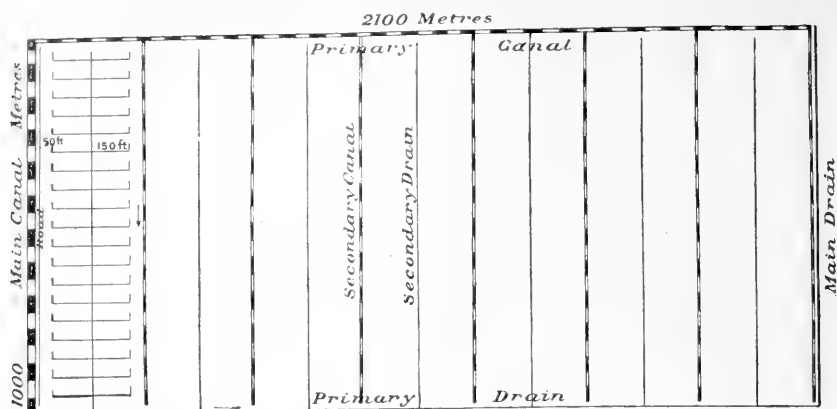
FIRST PLAN OF DRAIN ARRANGEMENT.
